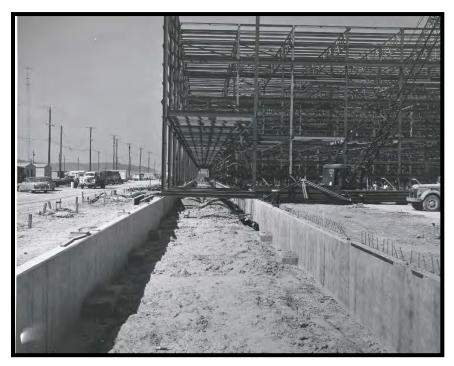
Foundation Construction of the X-330 Process Building, August 1953
